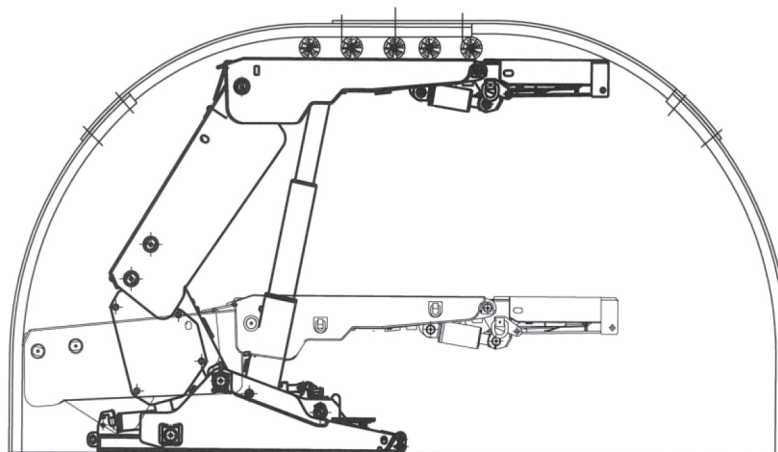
ŁPKO frame with an installed powered support unit (unit before and after spragging)
